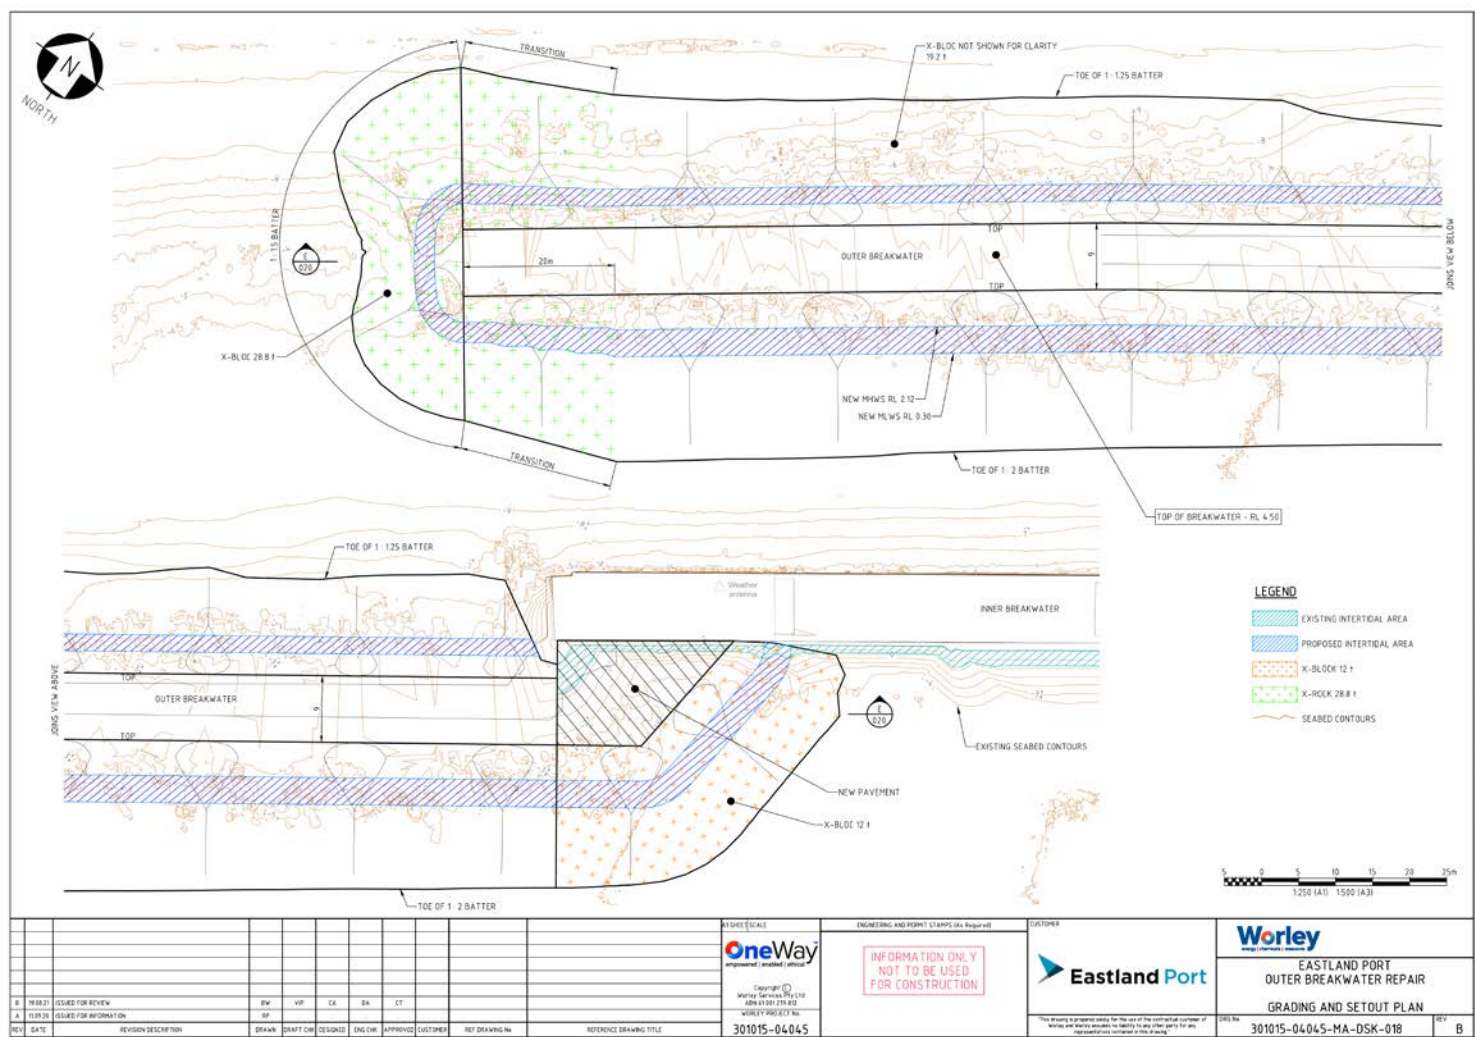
Eastland Port Outer Breakwater Repair Grading and Setout Plan
